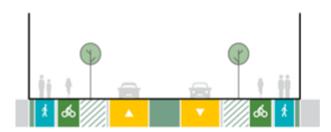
CFAF Outcome - New Connection between Milldale and Grand Drive indicative 24 m cross section
